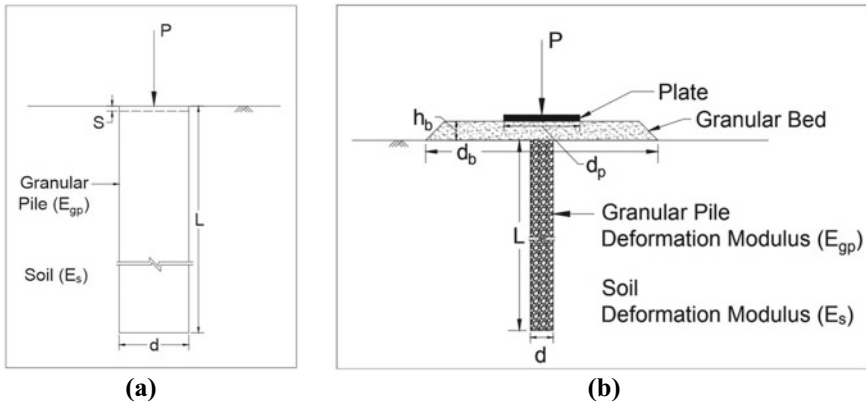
a Settlement of compressible pile under axial load b Definition sketch for a load test
